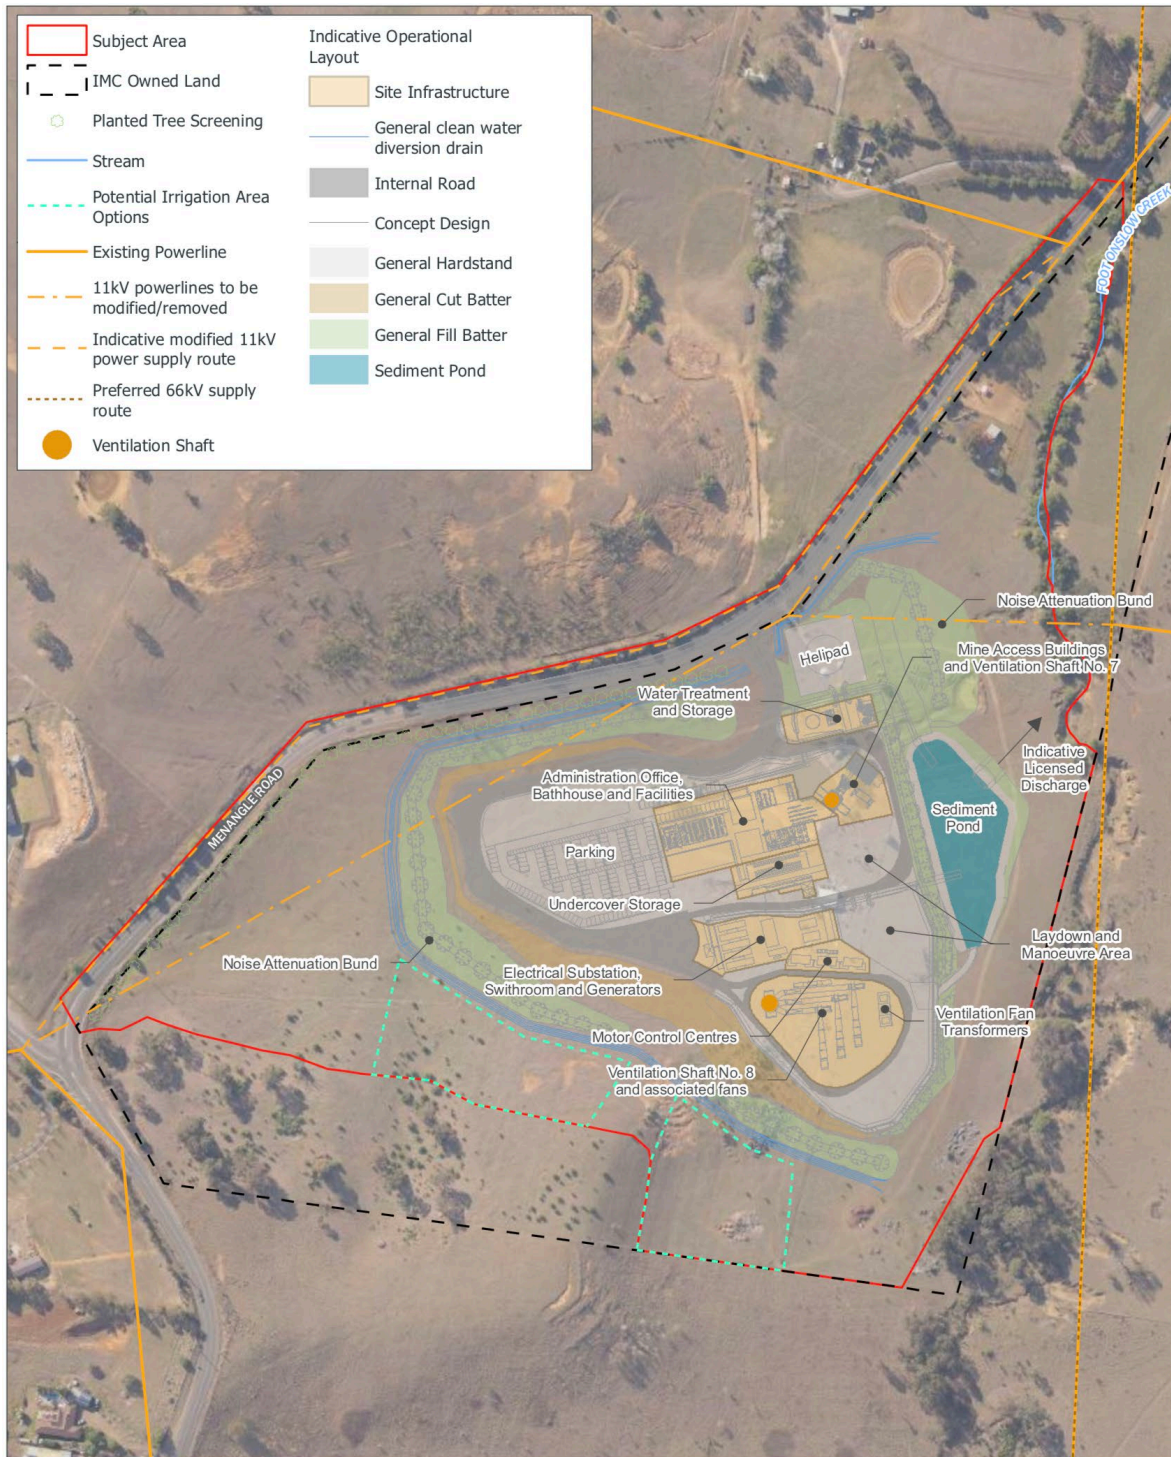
| Proposed Ventilation and Access Modification Site Layout
